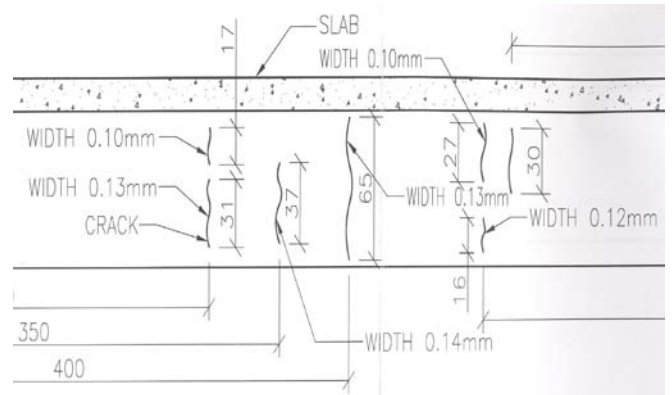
Cracks on Beams at 100% Loading (after 24 hours)
